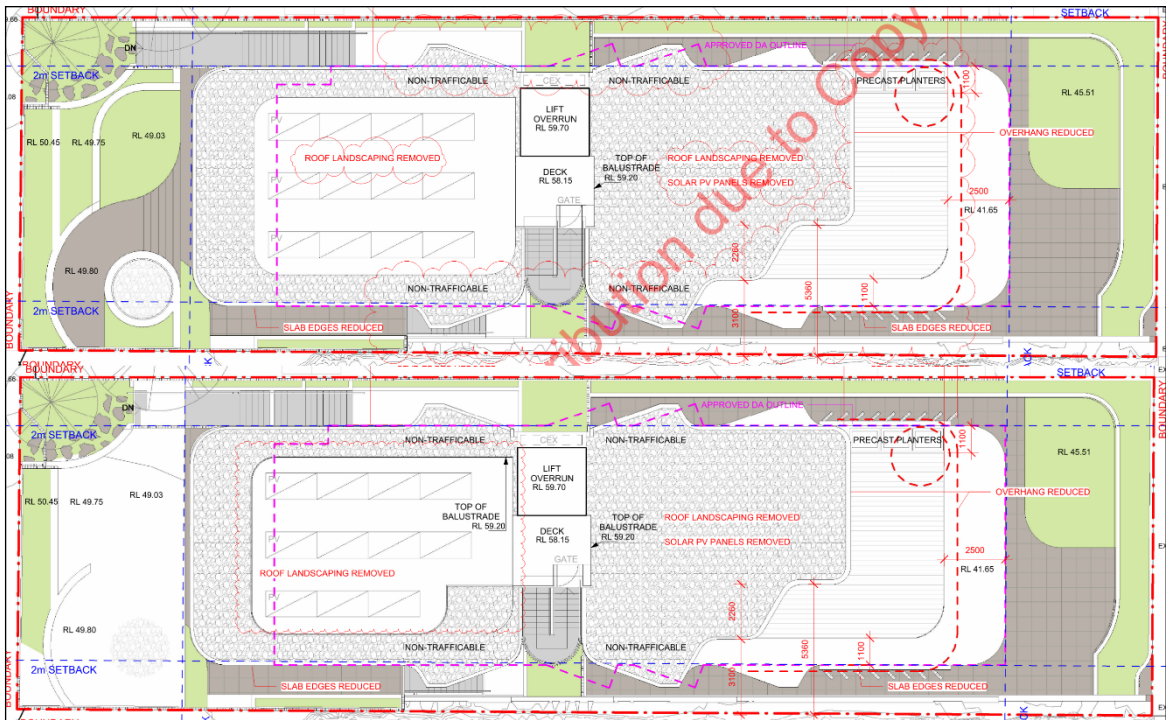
Existing (top) and proposed (bottom) roof plan (source: Orosi)
